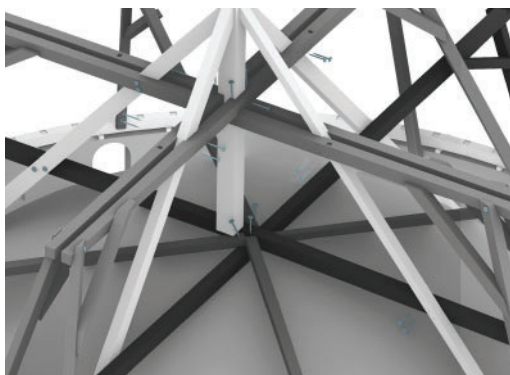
Nailed connections of the collar-beams with the struts and king-post (3D model: author).
